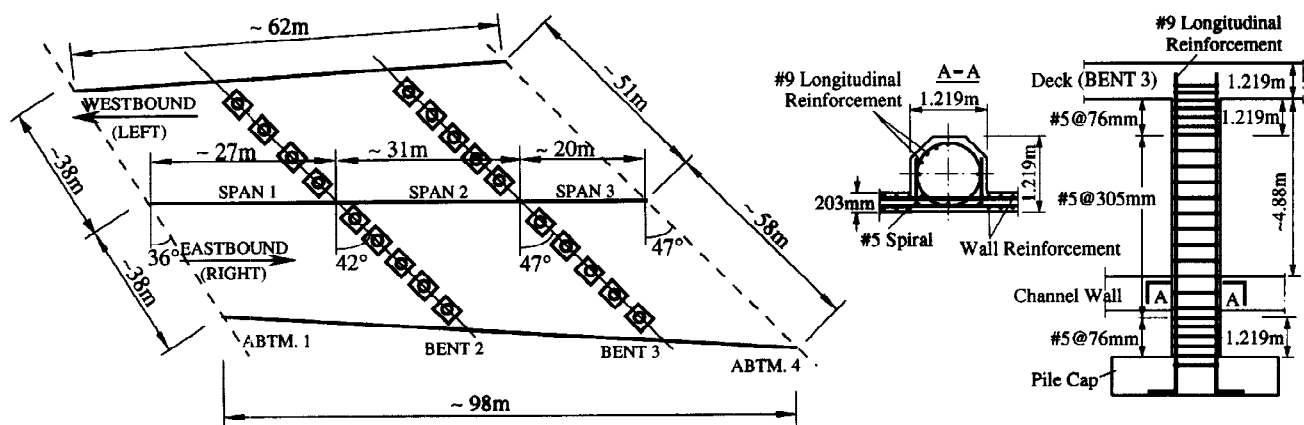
Bull Creek Canyon Channel bridge and details of column reinforcement
